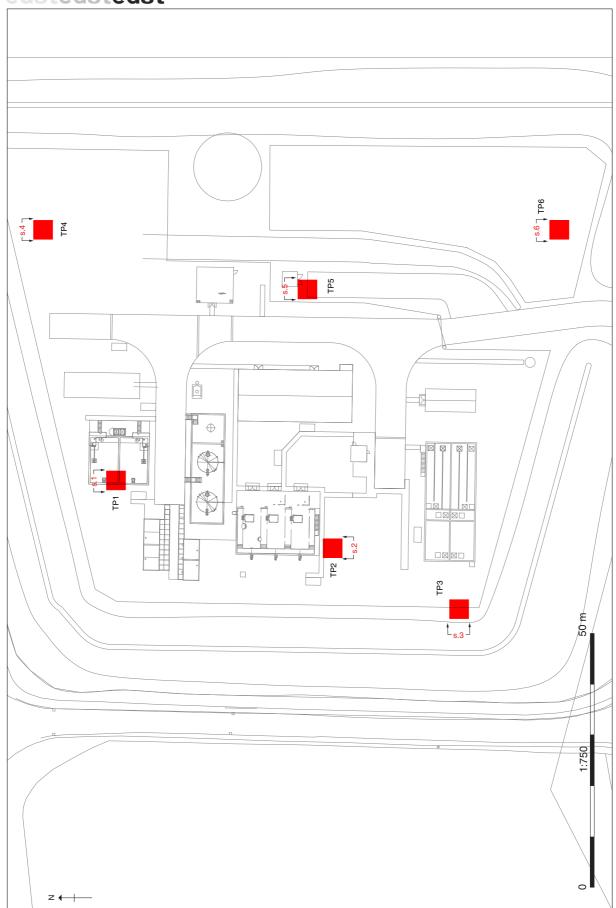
Plan showing location of test pits 1-6. Scale 1:750
